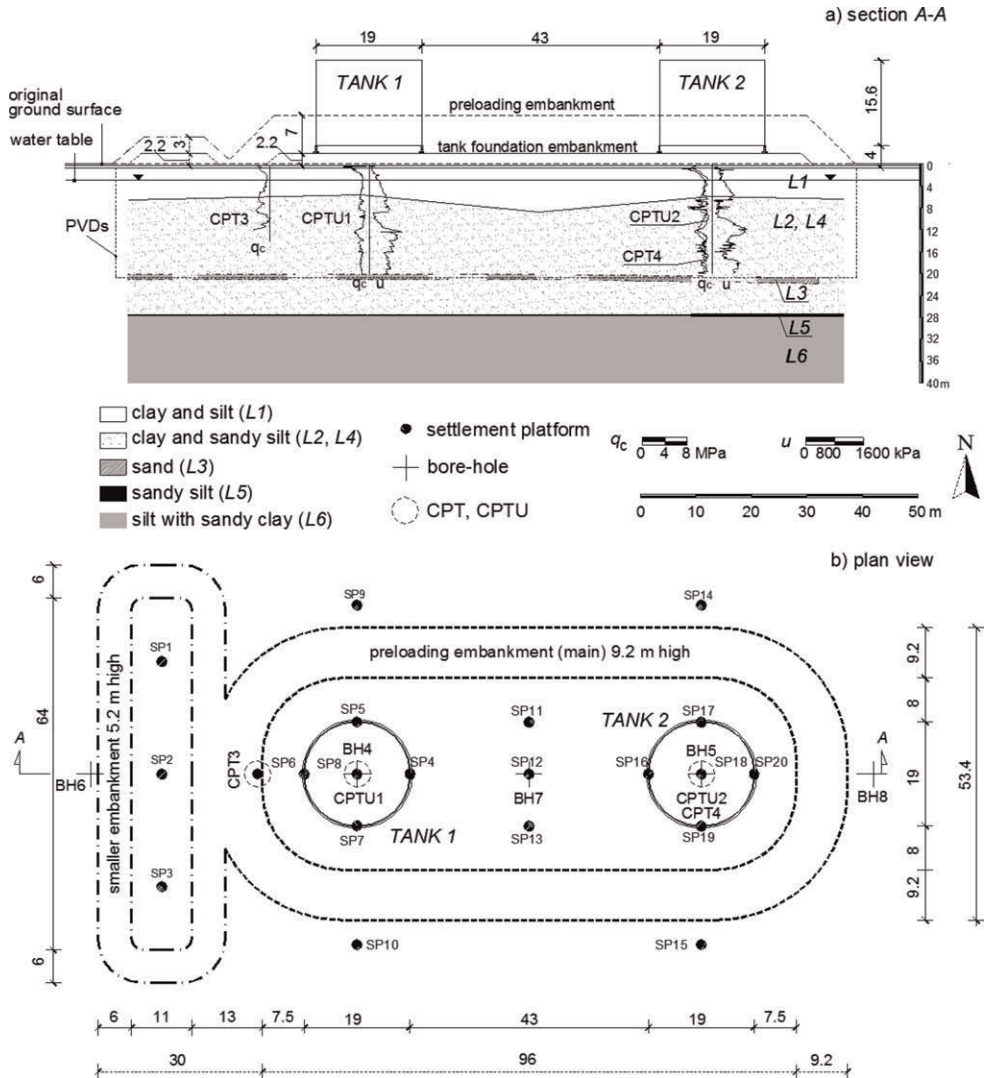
a) Longitudinal cross-section of the site; b) plan view of the preloading embankment, location of the geotechnical investigations and of settlement platforms (adapted from Di Filippo *et al.* 2017 and Cascone & Biondi 2013).
